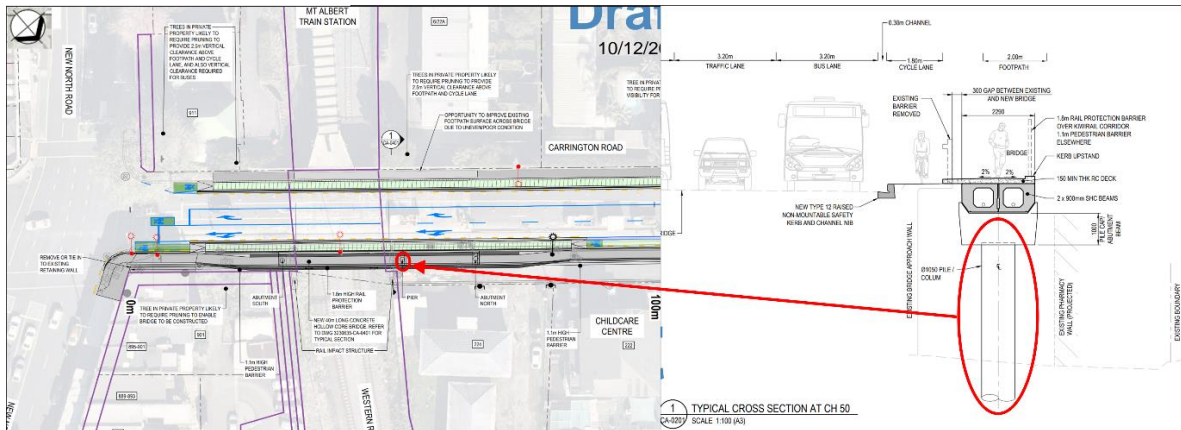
Excerpt of preliminary General Arrangement Plan CH 0 to CH100 (DWG 3230635-CA-0201 Rev A) and Typical Cross Section (DWG 3230635-CA-0401 Rev A) showing new active mode bridge over the KiwiRail NAL designation and indicative location of pier / column.
